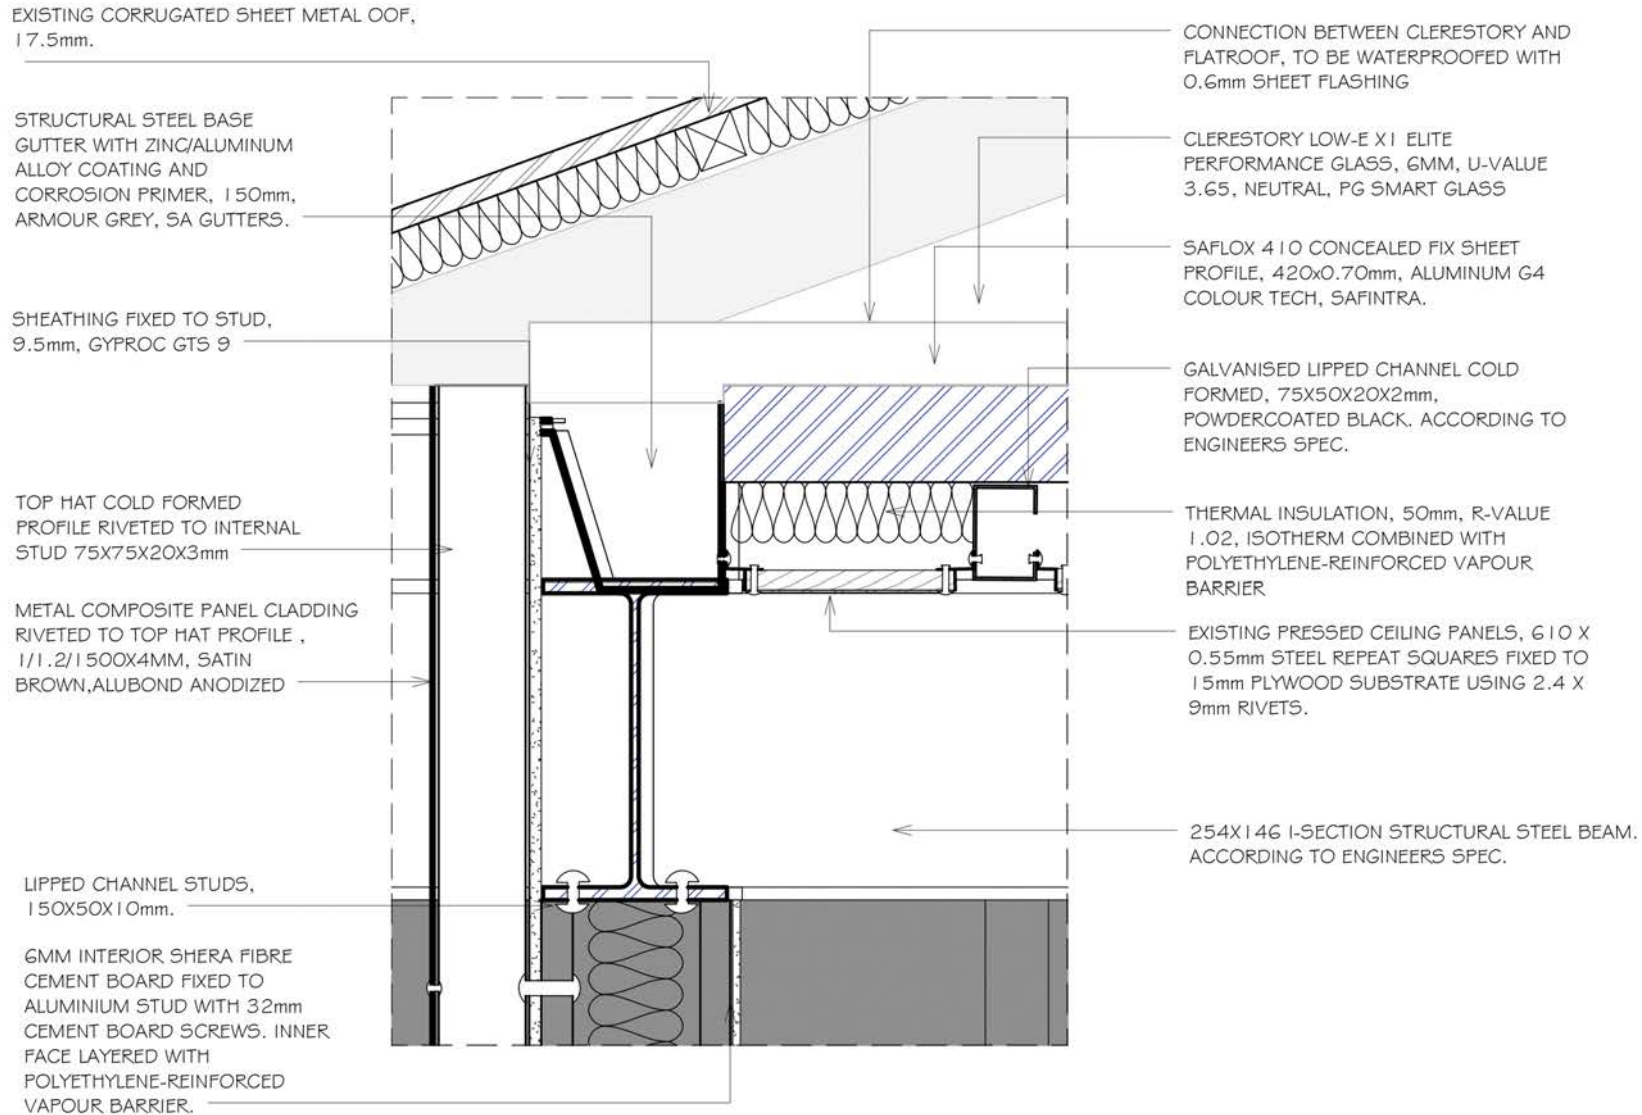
Detail 3 roof and facade, not to scale (Author 2018)
